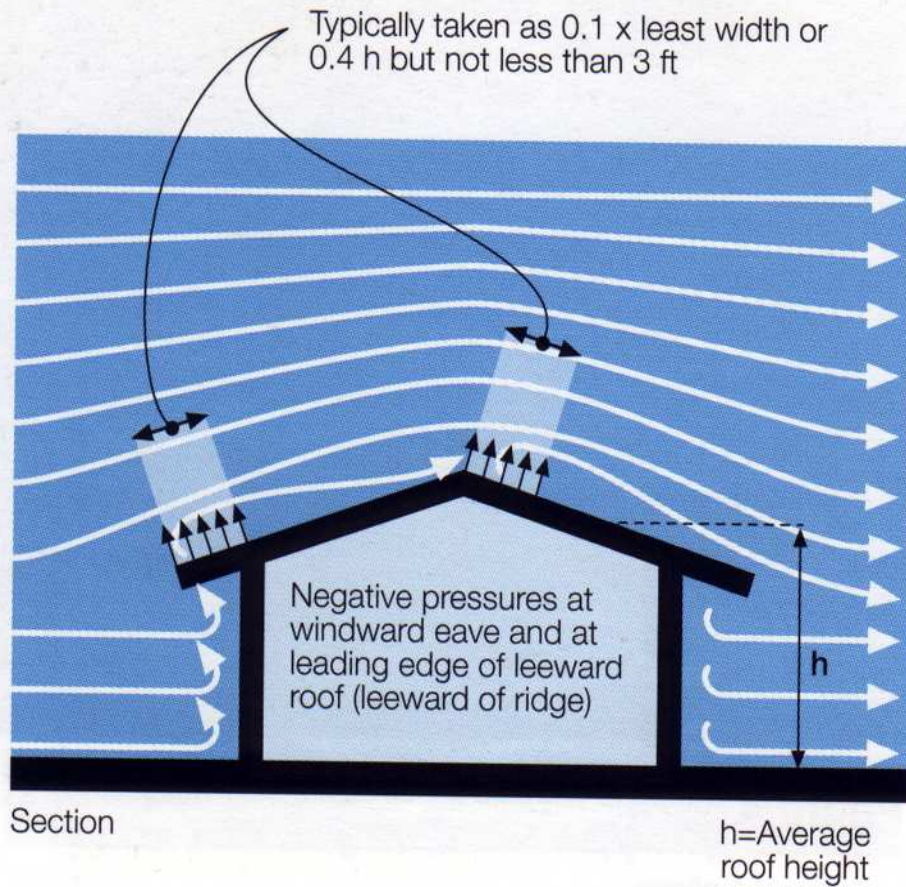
UPLIFT PRESSURE AT ROOF OVERHANG
